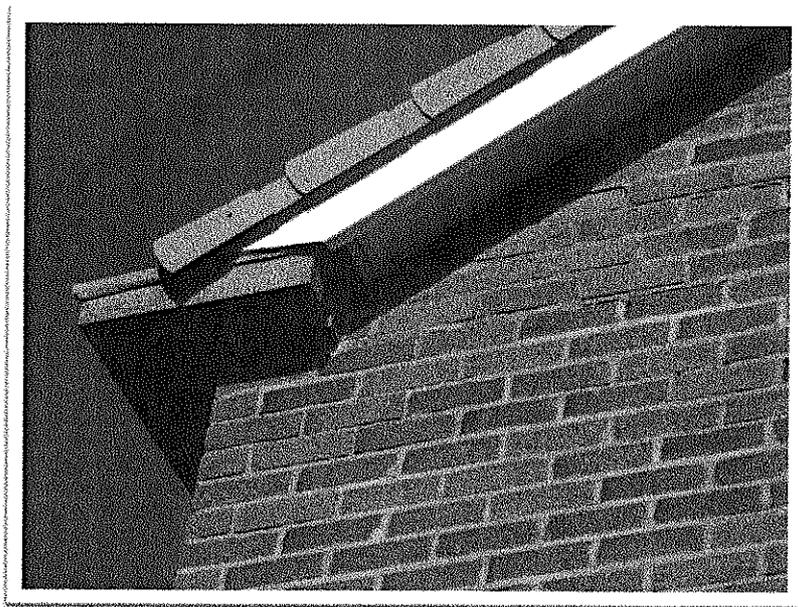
Roof, left hand side gable, PVC soffits and verge capping's
